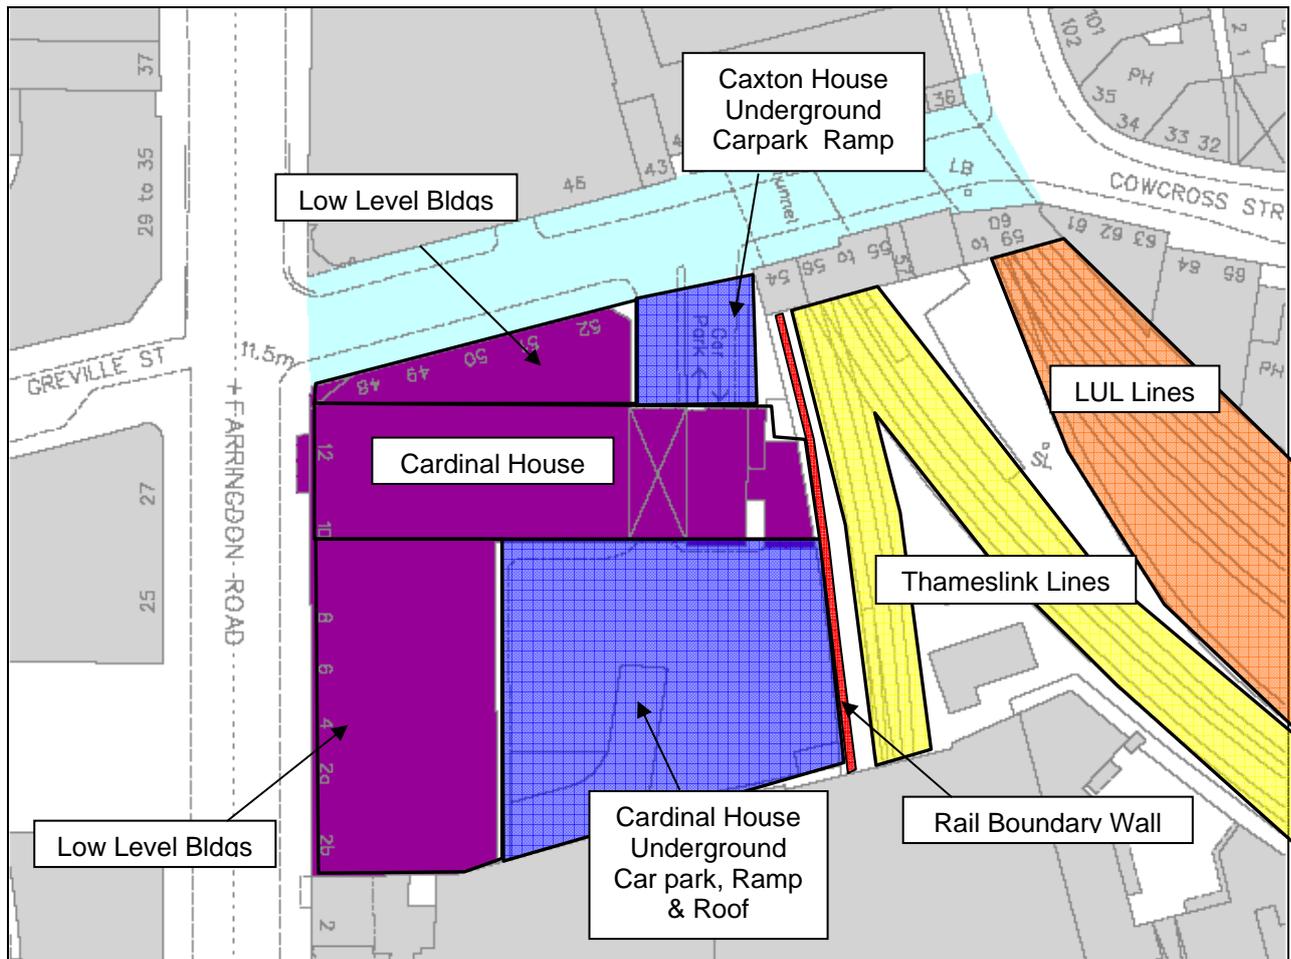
Property Locations for Demolition at Western Ticket Hall - Cardinal House worksite
